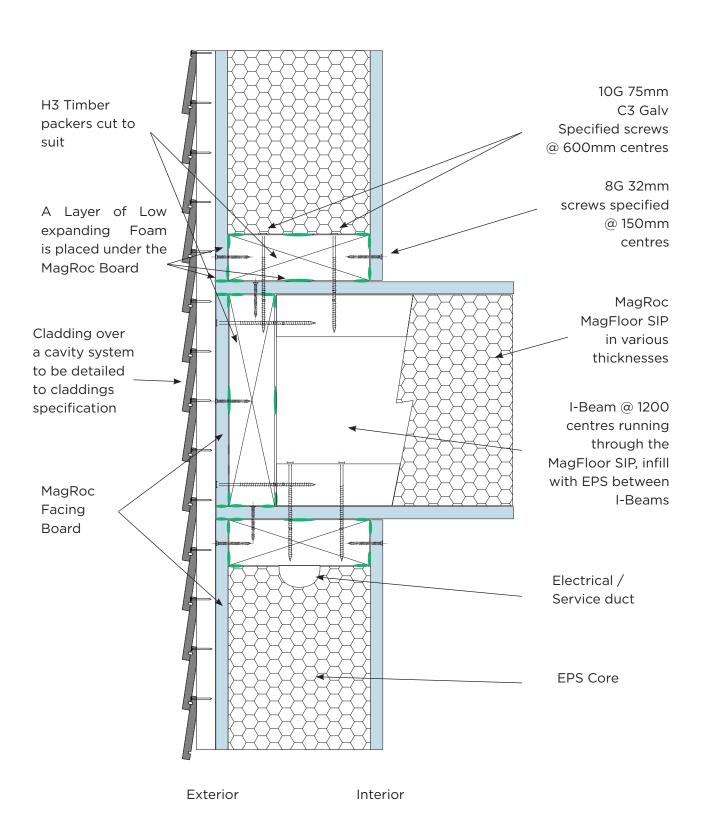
MagRoc 'Typical' Mid Floor with Cladding on a Cavity System
